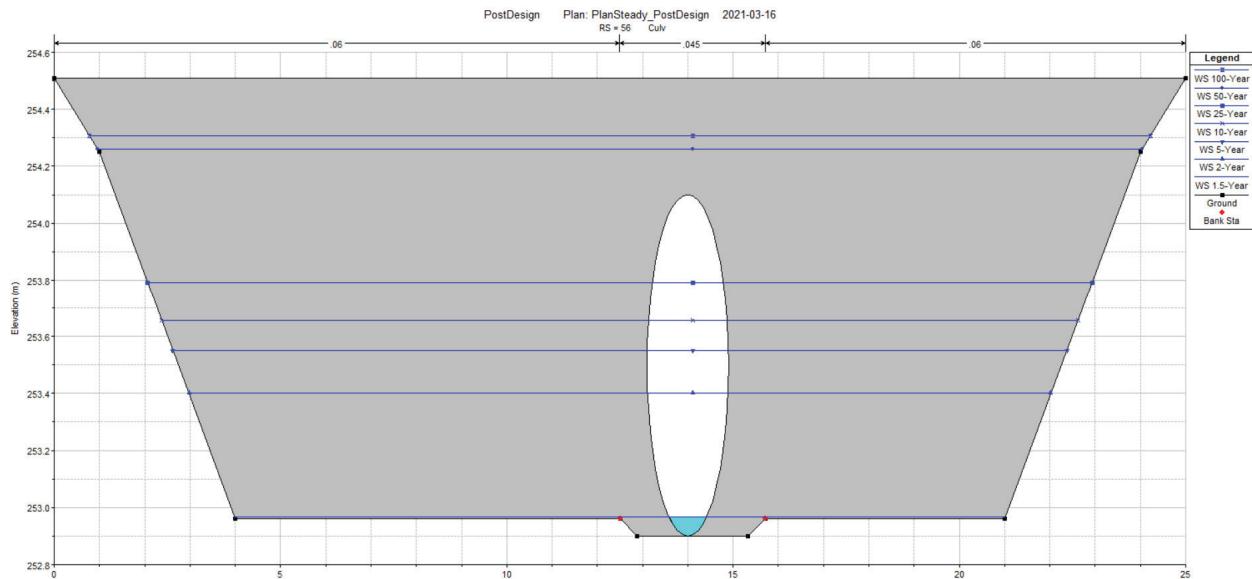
The cross section of Culvert Opening Cross Section at Mayfield Road after Hydraulic Modelling
